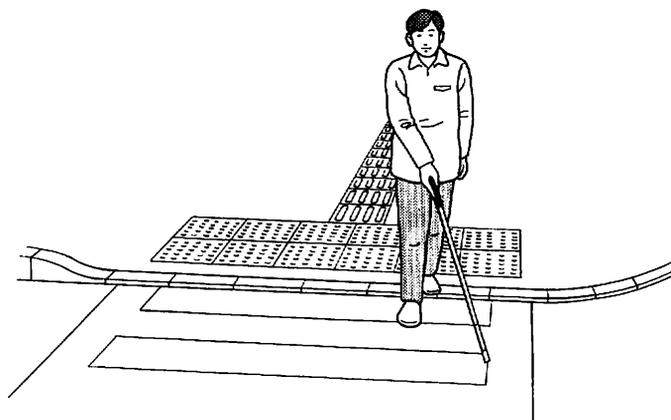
Finding a crossing point (Example of stepping out on to a roadway)
